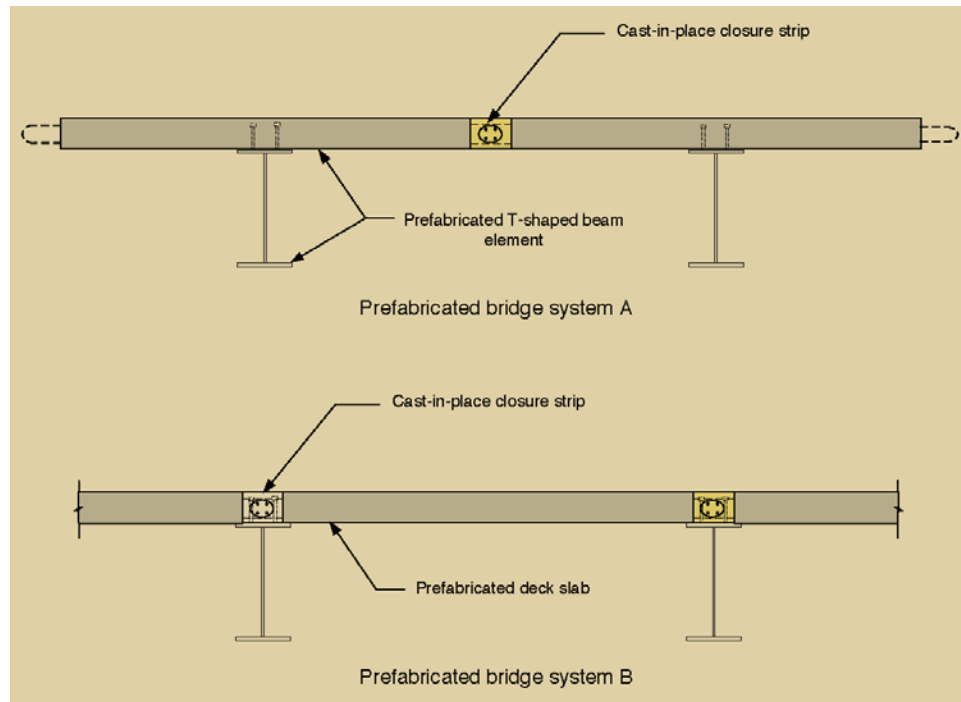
Typical Transverse Sections of Prefabricated Bridge System Specimens (Au et al. 2008)
